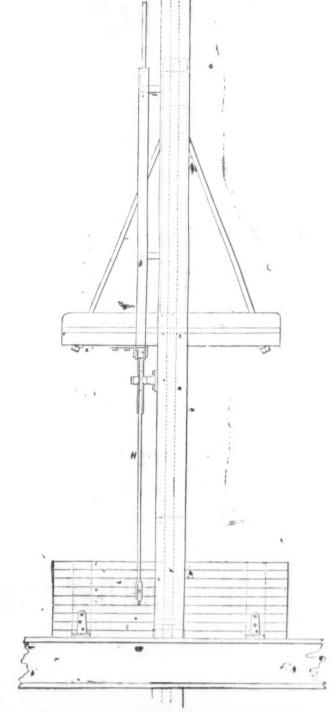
Side View of Elevator Car, Hatchway and Levers.
